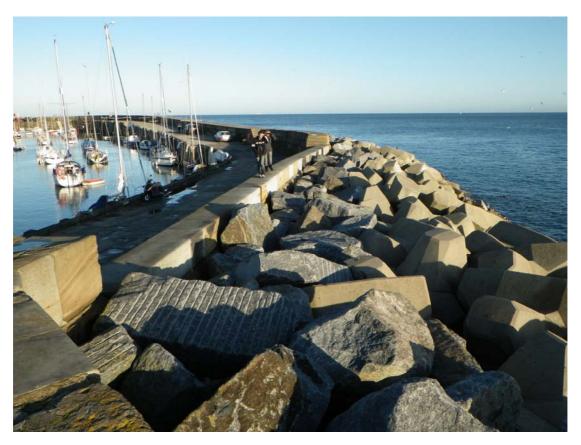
East Pier, southern section, modern rock armour laid against east face, showing short new section of parapet with older sections to north and south
